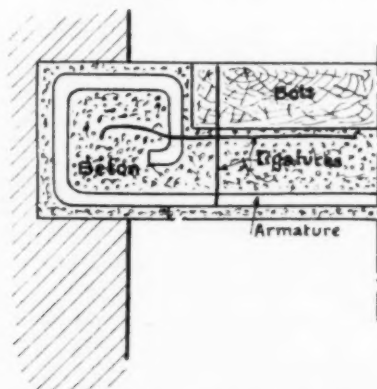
GERMAN STEEL-WOOD REINFORCED-CONCRETE BEAM (Beton, concrete; Bois, wood; Armature, steel reinforcement; Ligatures, tie pieces.)
